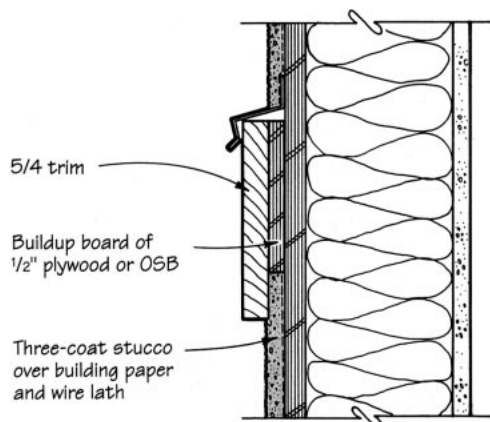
Tudor-style exteriors typically call for 6/4 or 8/4 trim boards. Because clear, rot-resistant stock of this thickness is at a premium, the author recommends using a buildup board of sheathing material underneath 5/4 trim stock. The trim board should be painted or stained on all surfaces.
